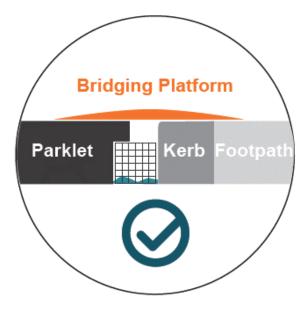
Bridging platform covers a gap between the platform and the kerb upstand
